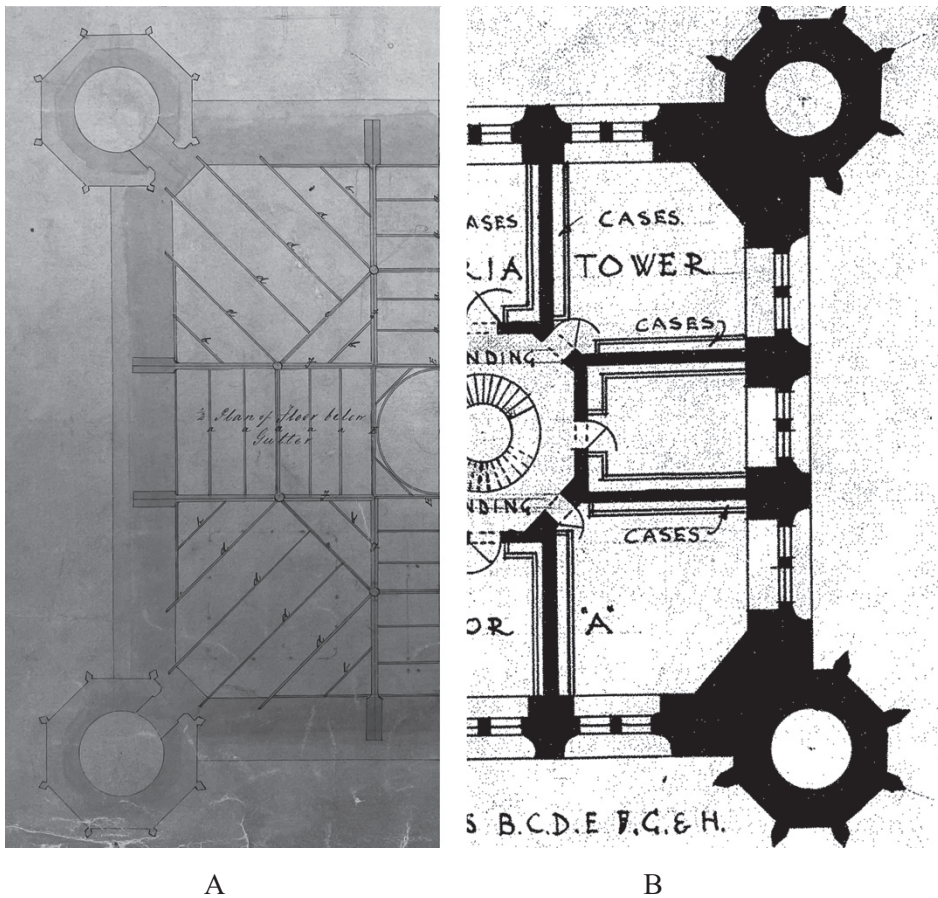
Half plans of Victoria Tower. (A) plan from July 1857, showing the layout of iron beams, and (B) the compartmentation of archive spaces on the second floor, 1938 (Source: (A) National Archives: Work 29/755, Plans and section of roof showing ironwork, July 1857; (B) IHSE Architectural Archive, Plan of the Second floor 1938, Office of Works, 1076/1).
